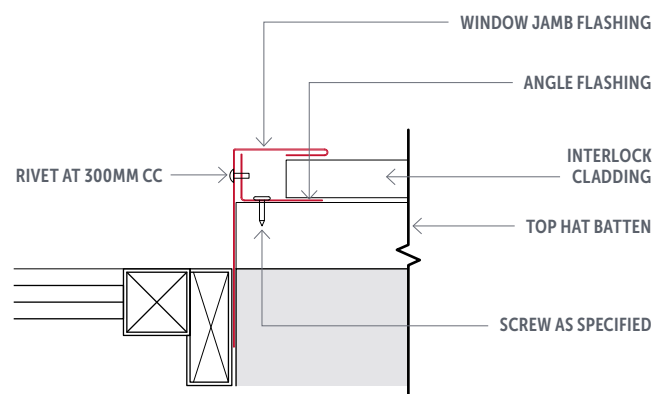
Section C-C Flashing Fixed Prior To Panel,
